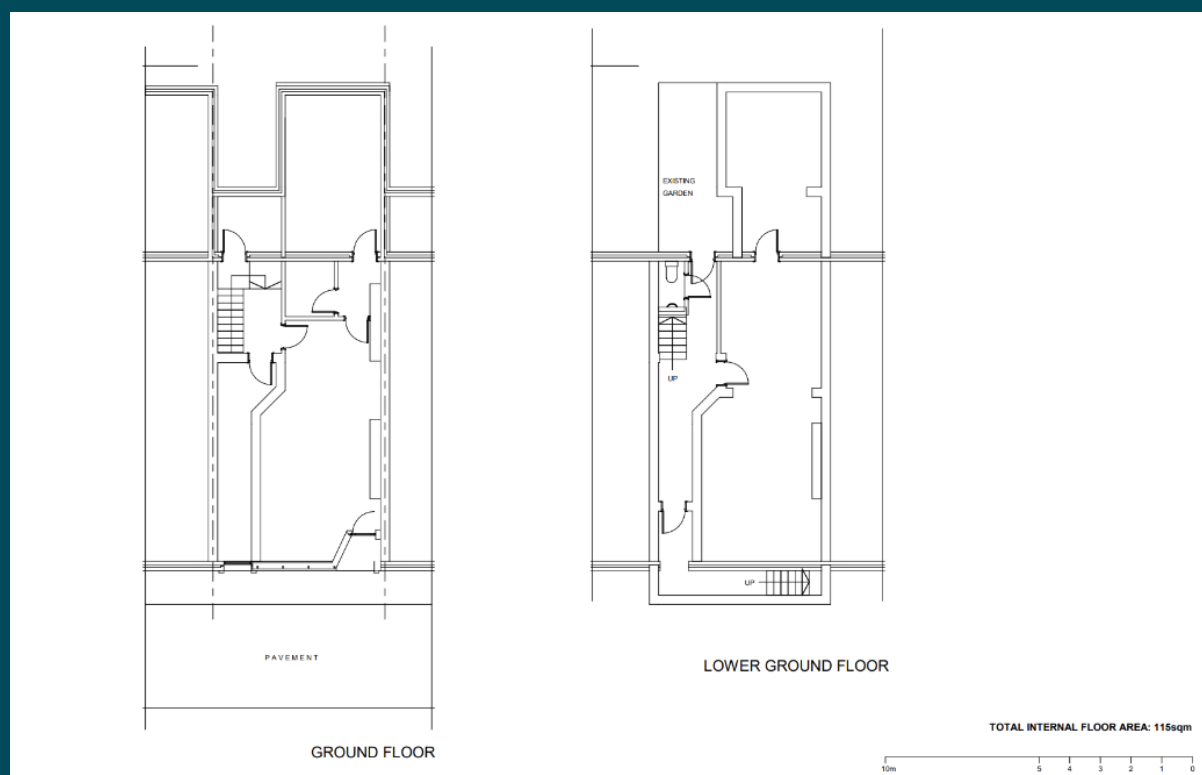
Existing and Proposed Floor Plans. (Not to scale please see supporting planning drawings).
